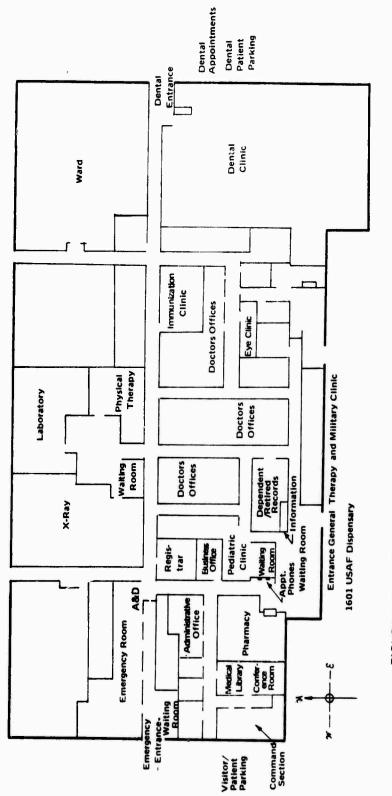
FLOOR PLAN OF THE MAIN DISPENSARY AT NORTON AFB
